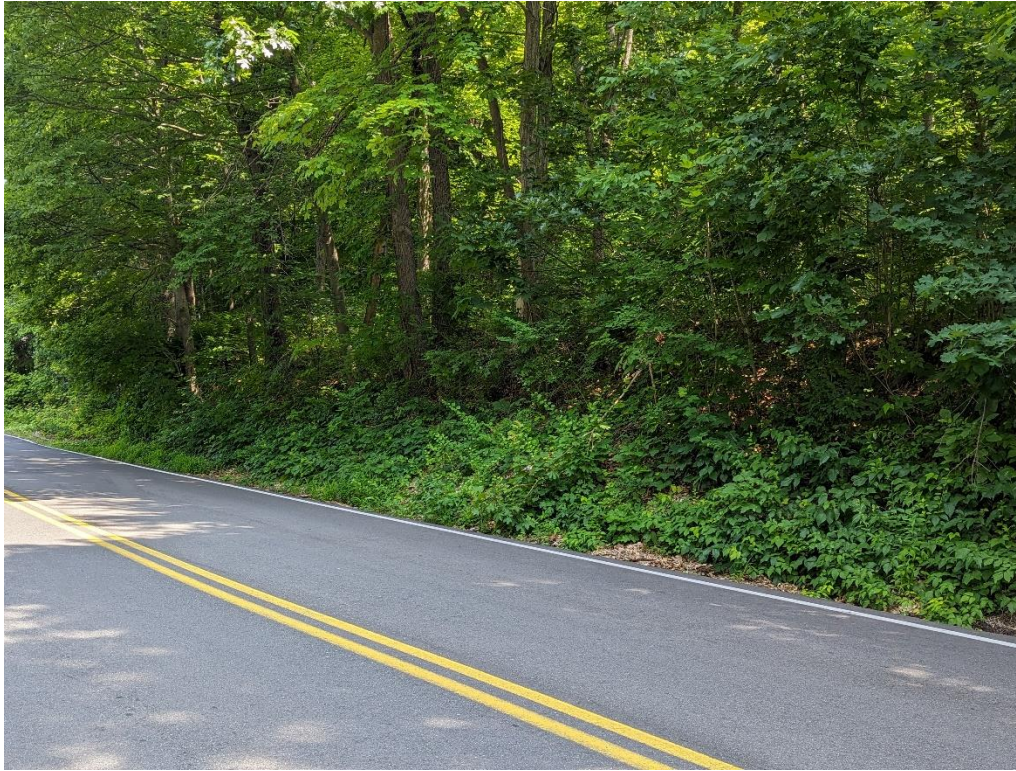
Sloped southern portion of APE of proposed access road, view to north.
